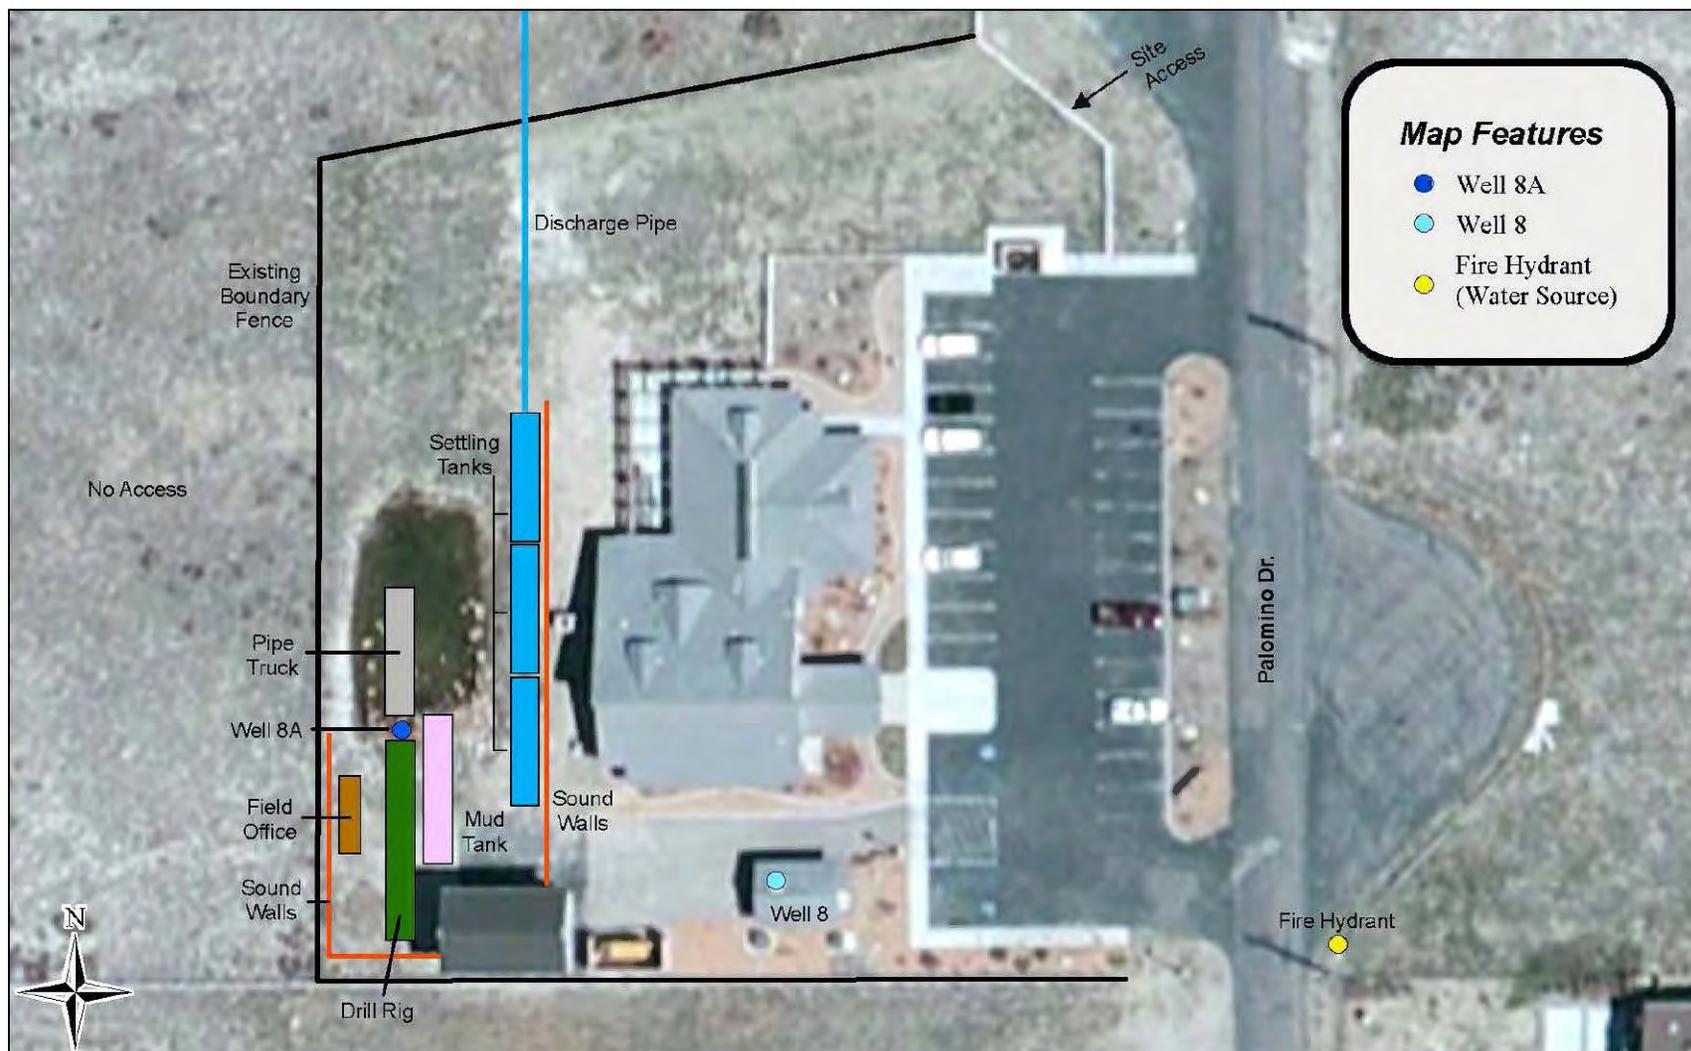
Aerial photograph of the project site, showing existing and proposed facilities.
